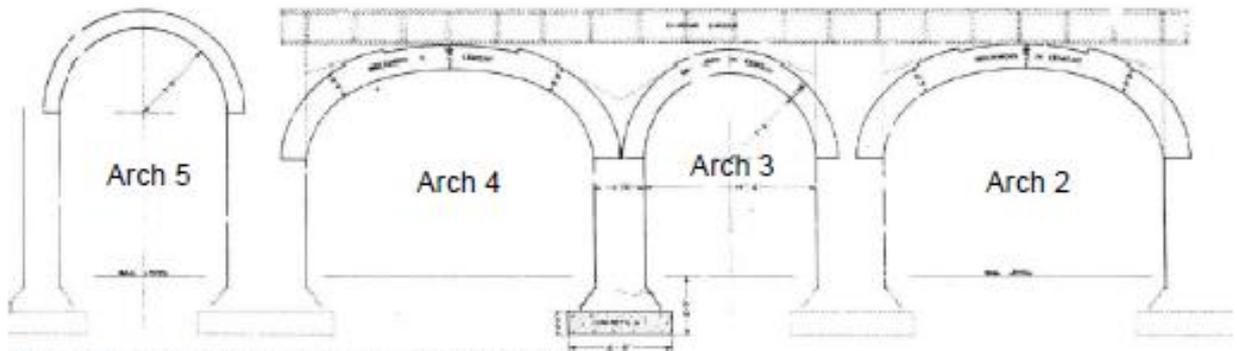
View on east elevation of current bridge form (looking west). Arch 1 not shown in above illustration.
